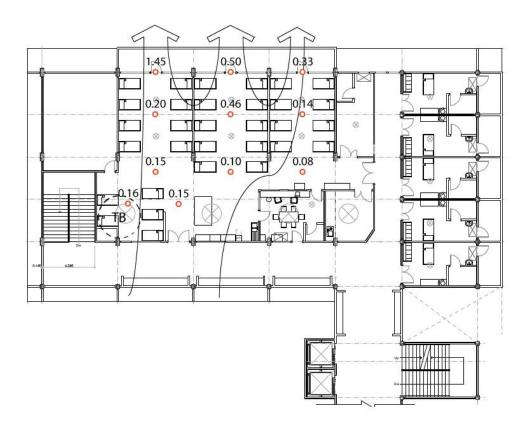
Floor plan and ventilation data of hospital F inpatient ward
